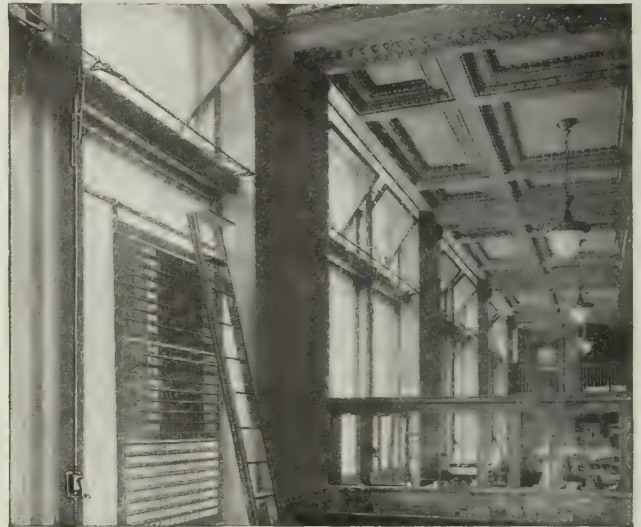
SCREW THREAD TRANSOM OPERATORS
